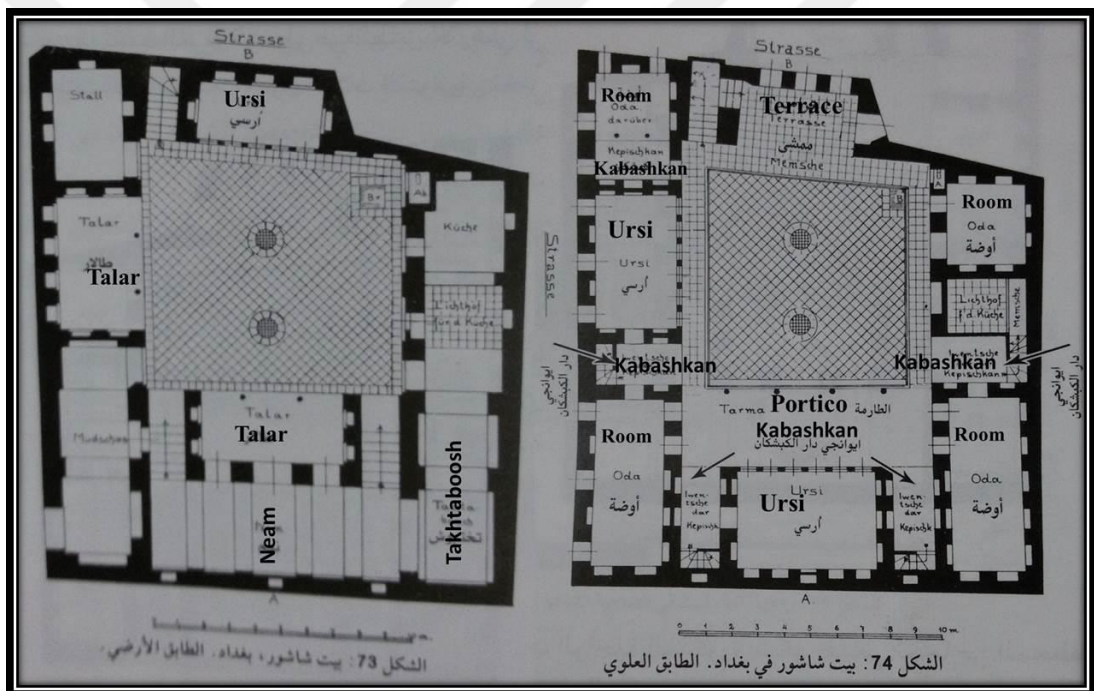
Shashor House in Baghdad, Ground Floor Showing, Ursi, Talar, Neam, Takhtaboosh, and First Floor Showing, Rooms, Portico, Kabashkan, Terrace, And Ursi [152].
